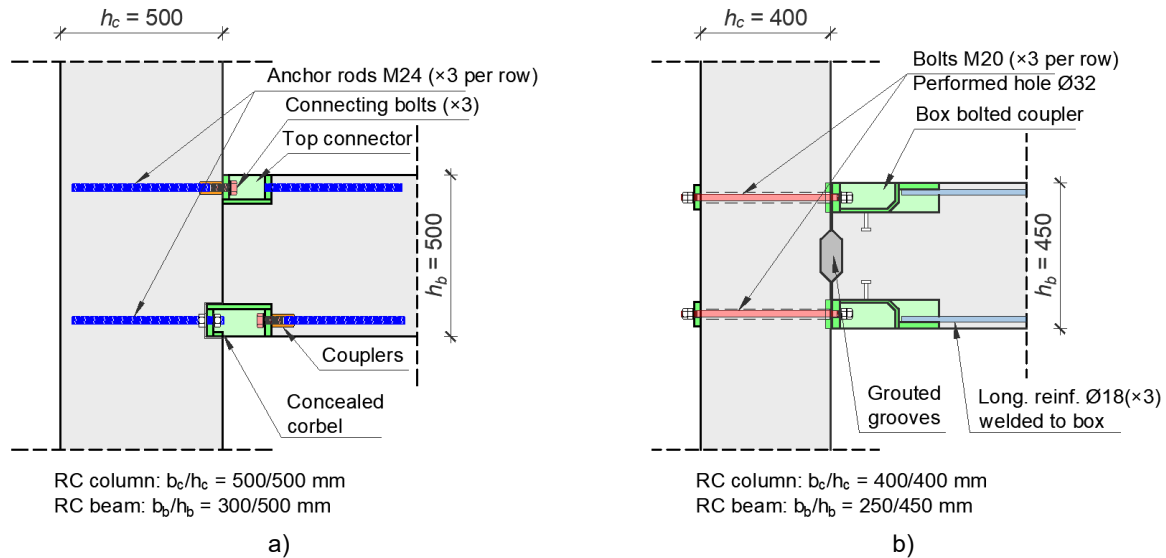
Beam-to-column joints with steel boxes: (a) connection with concealed corbel end threaded rods (adapted from Zhang et al. [24]), (b) connection with grouted grooves and through anchor bolts (adapted from Zhang et al. [26])
